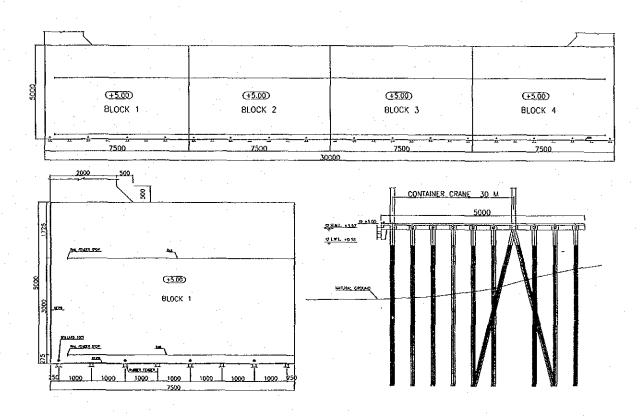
Plan and Elevation of 50,000DWT Container Quay
